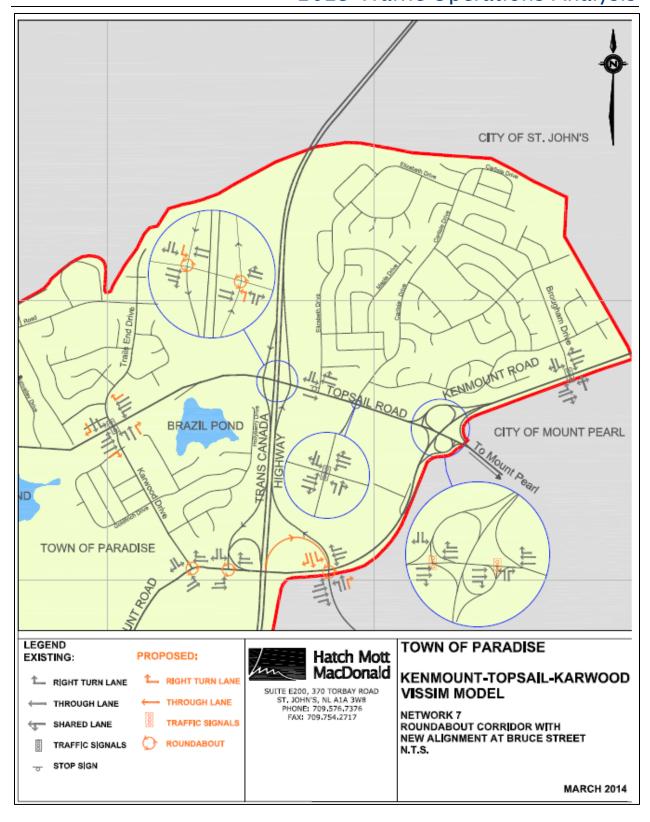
2025 Roundabout Corridor with new Bruce Street Alignment – Lane Configuration
